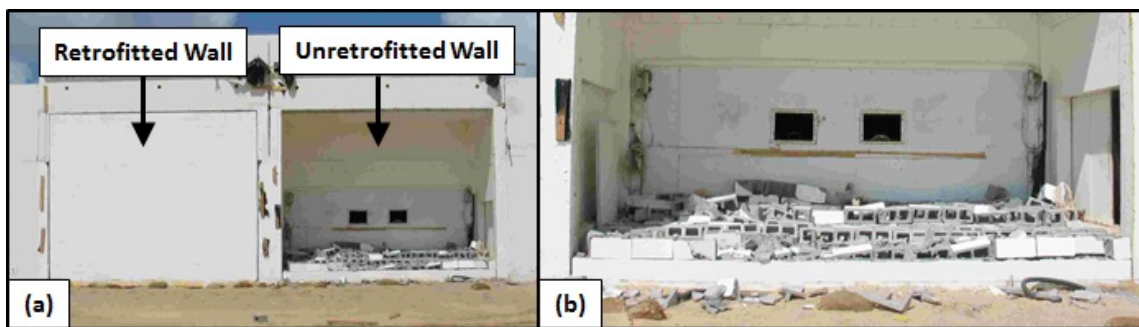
Wall response to hurricane. (a) CMU walls after the hurricane. (b) Unretrofitted wall debris inside reaction structure.
